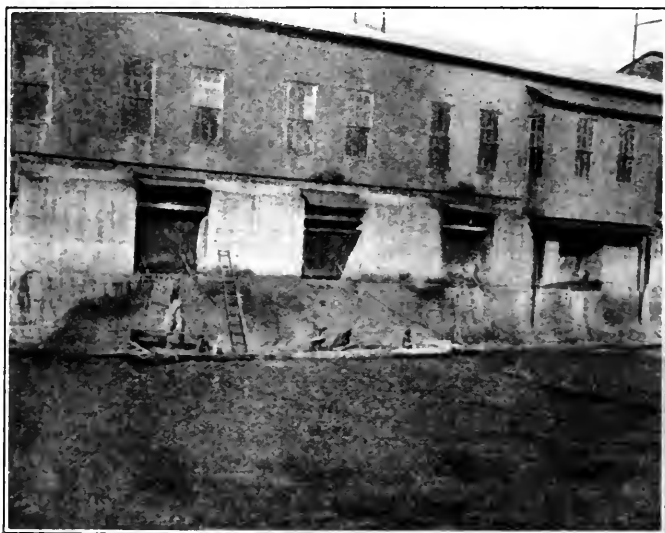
Repairing Spillway, Public Service Corporation, Joliet, Ill.
